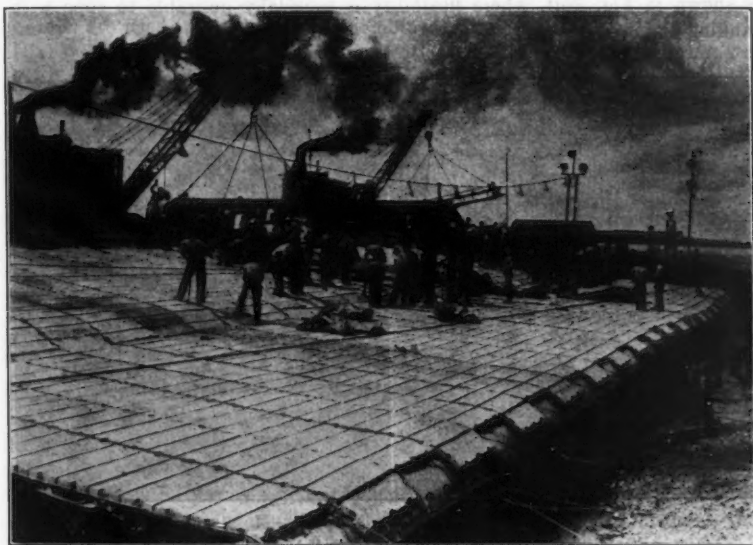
CONSTRUCTION PLANT FOR PLACEMENT OF ARTICULATED CONCRETE MATTRESS
